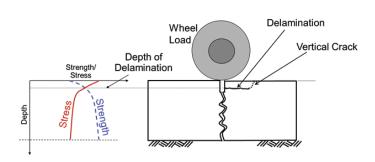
Early-agedrying stresses (left) and resulting horizontal cracking and delamination spalling (right) due to high moisture loss during placement (2)
